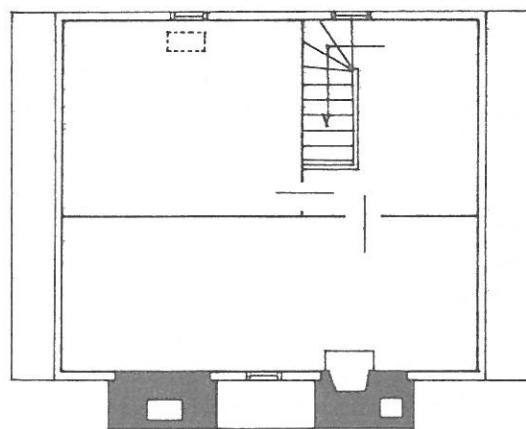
(top). Ground floor plan of Phase 1 (circa 1790). Dotted lines define placement of ceiling joists. Figure 4 (below). Attic plan, circa 1790.
